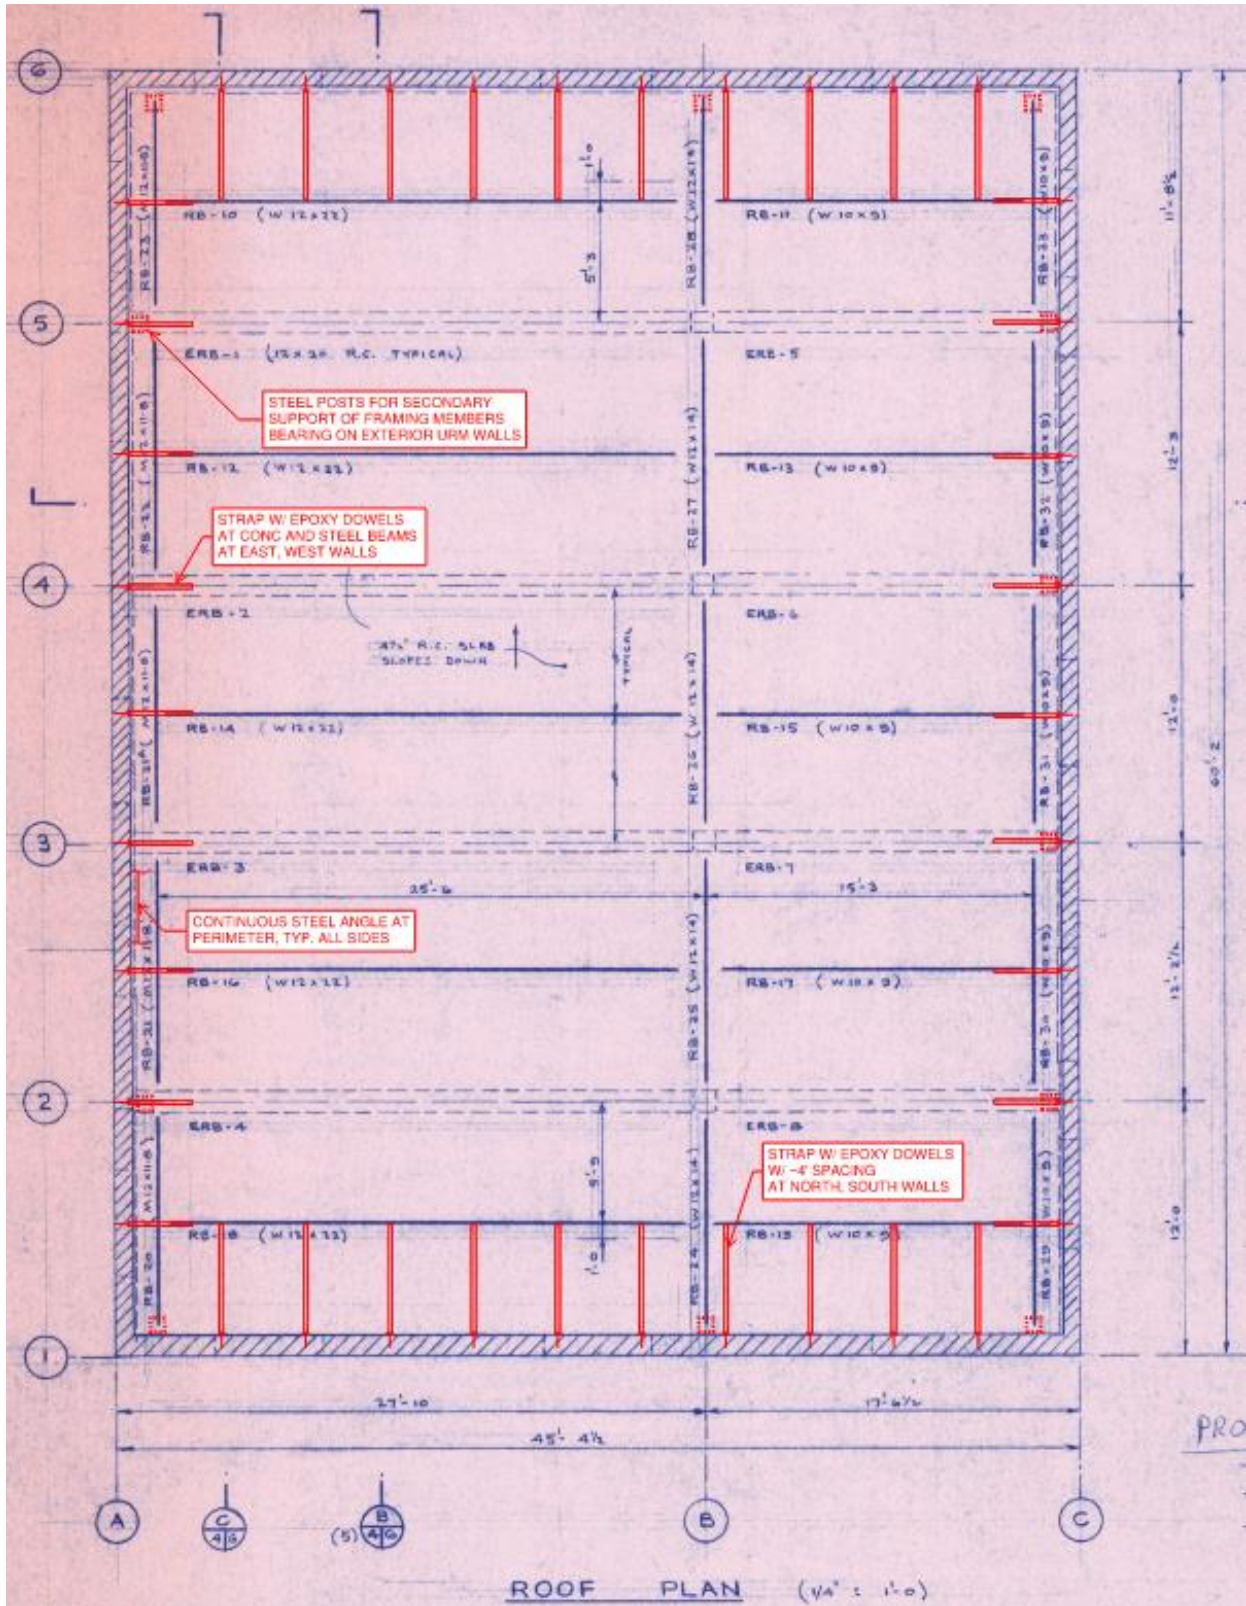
Courthouse Roof Plan from Sheet S-4 of the 1982 courthouse remodel drawings. WJE annotations are shown in red describing proposed conceptual retrofit options to address seismic deficiencies identified.
